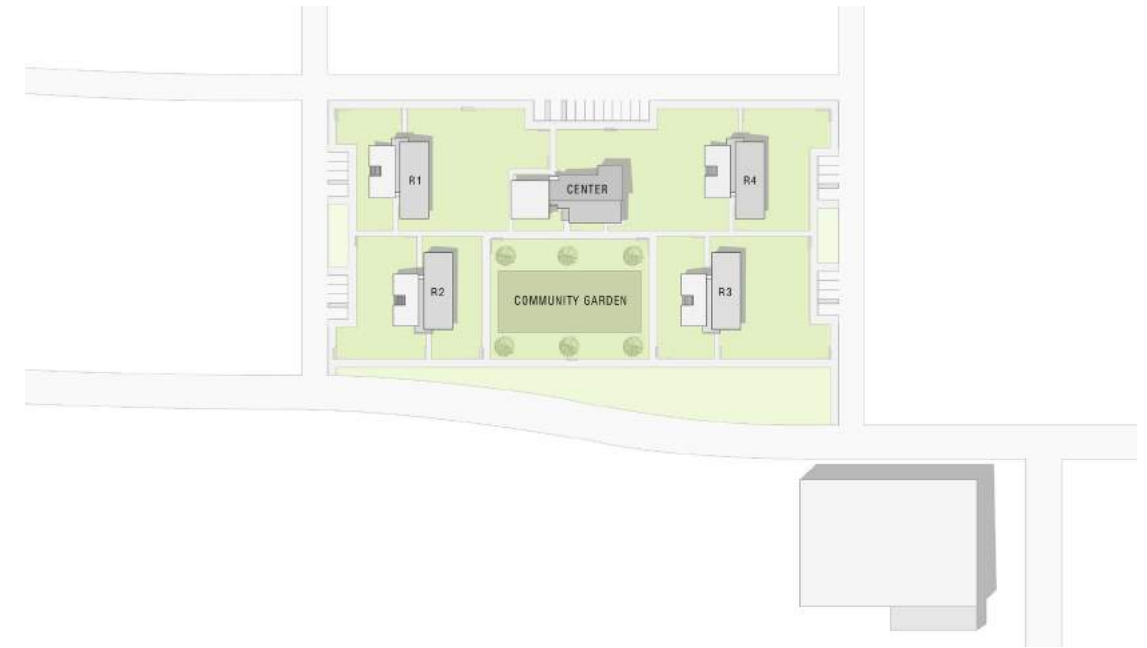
| Final site plan showing proposed connection to new roadways and potential parking spots
